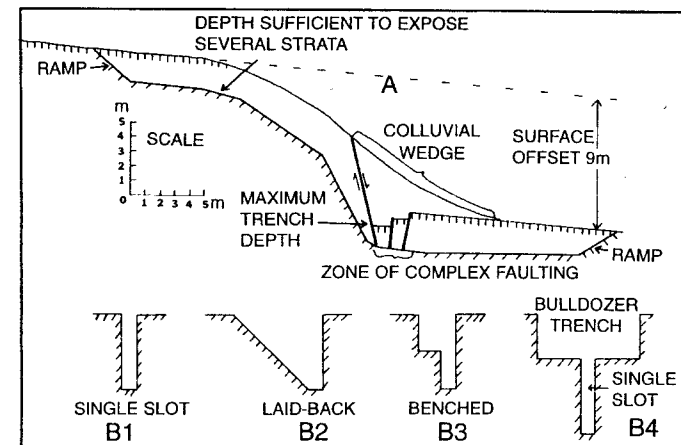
(A) Typical longitudinal section of a trench across a fault scarp; compare to Fig. 2.8. (B) Cross sections of various types of trenches. B1, single slot (California-style); B2, laid-back; B3, benched; B4, backhoe trench within a bulldozer trench. [From McCalpin (1989b); reprinted with permission of A. A. Balkema Publishers.]
